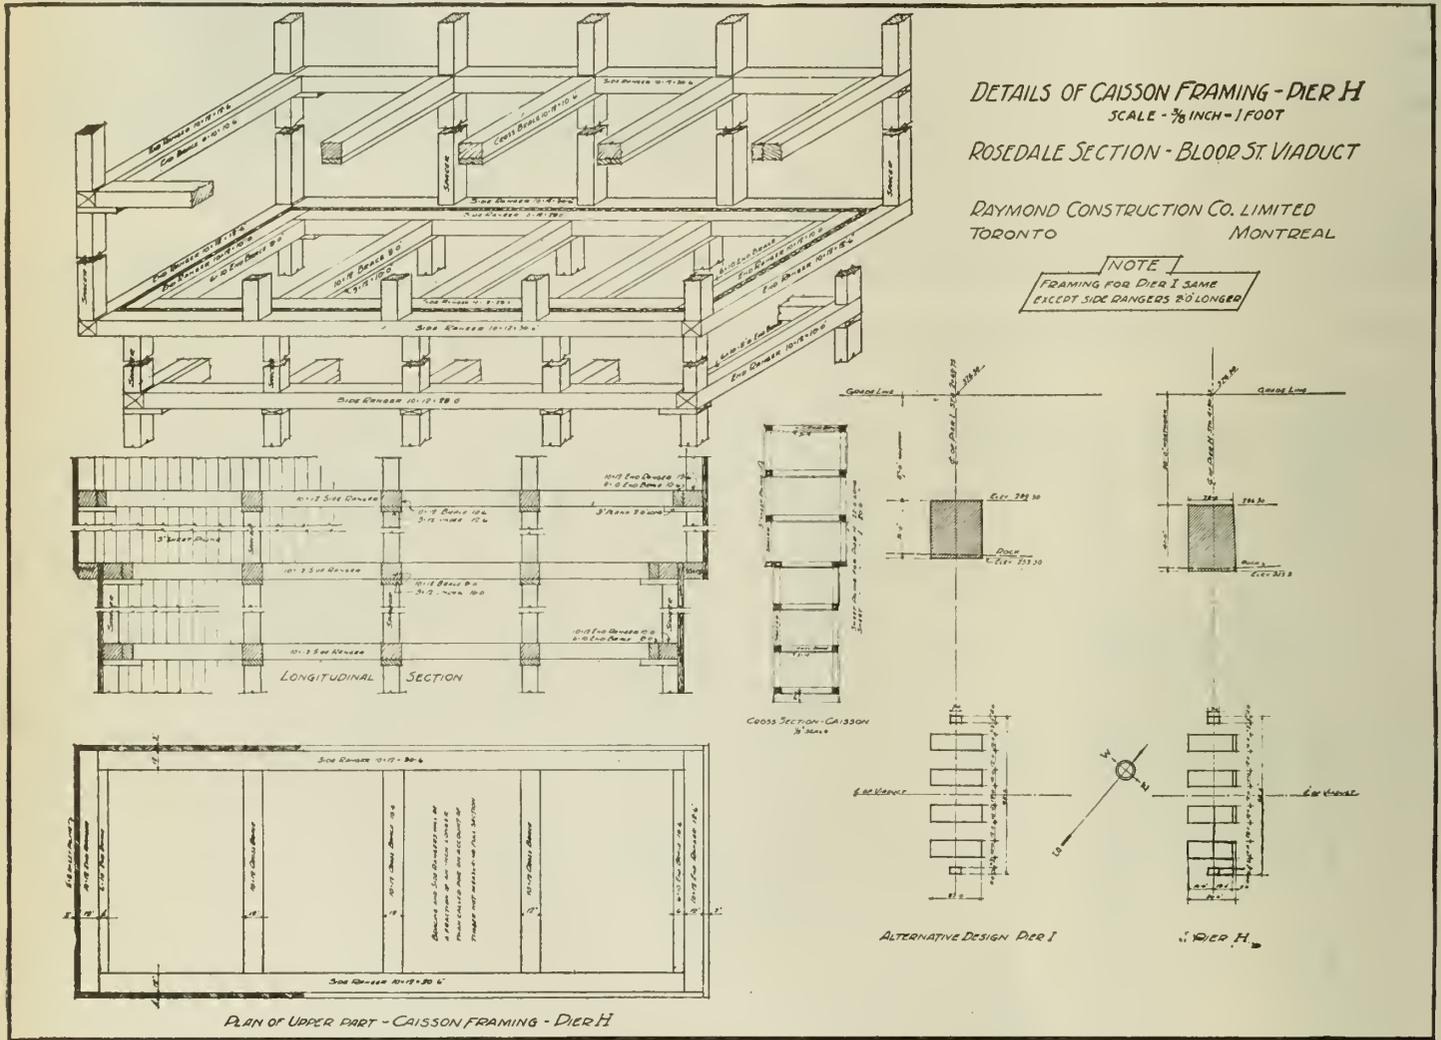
Sheeting Proposed by Contractors for Piers H and I, Rosedale Bridge.
